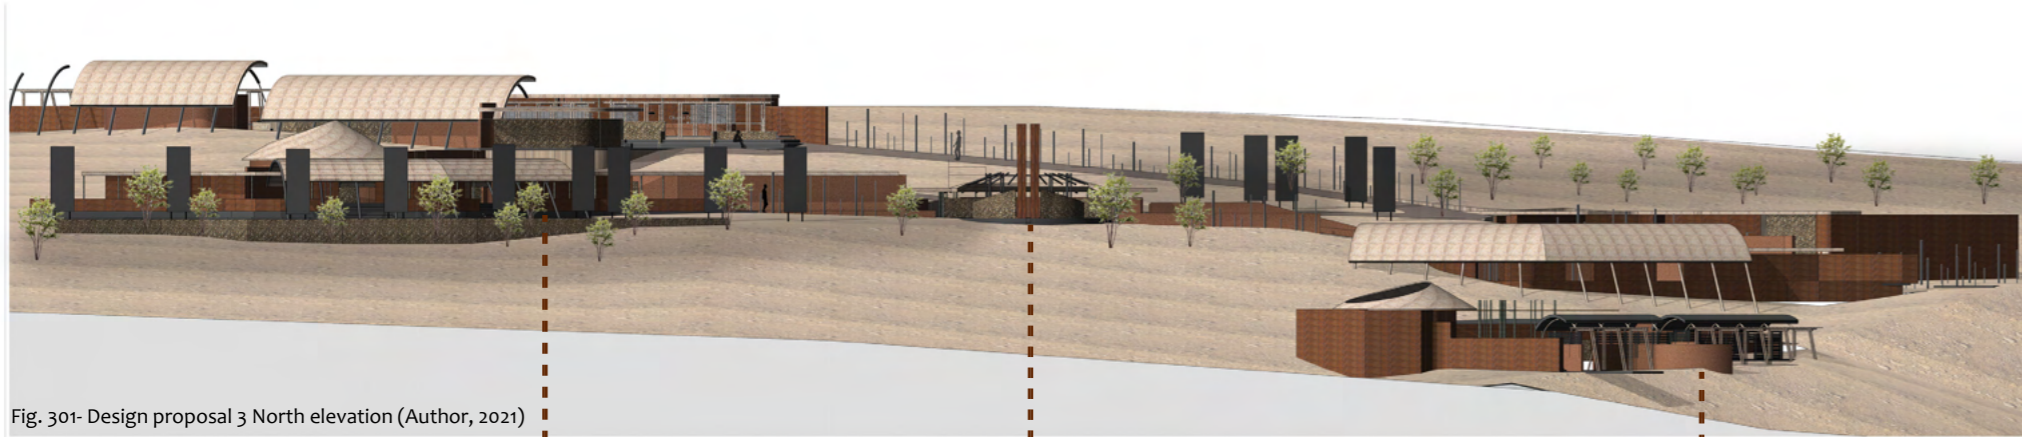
Design proposal 3 North elevation (Author, 2021)
